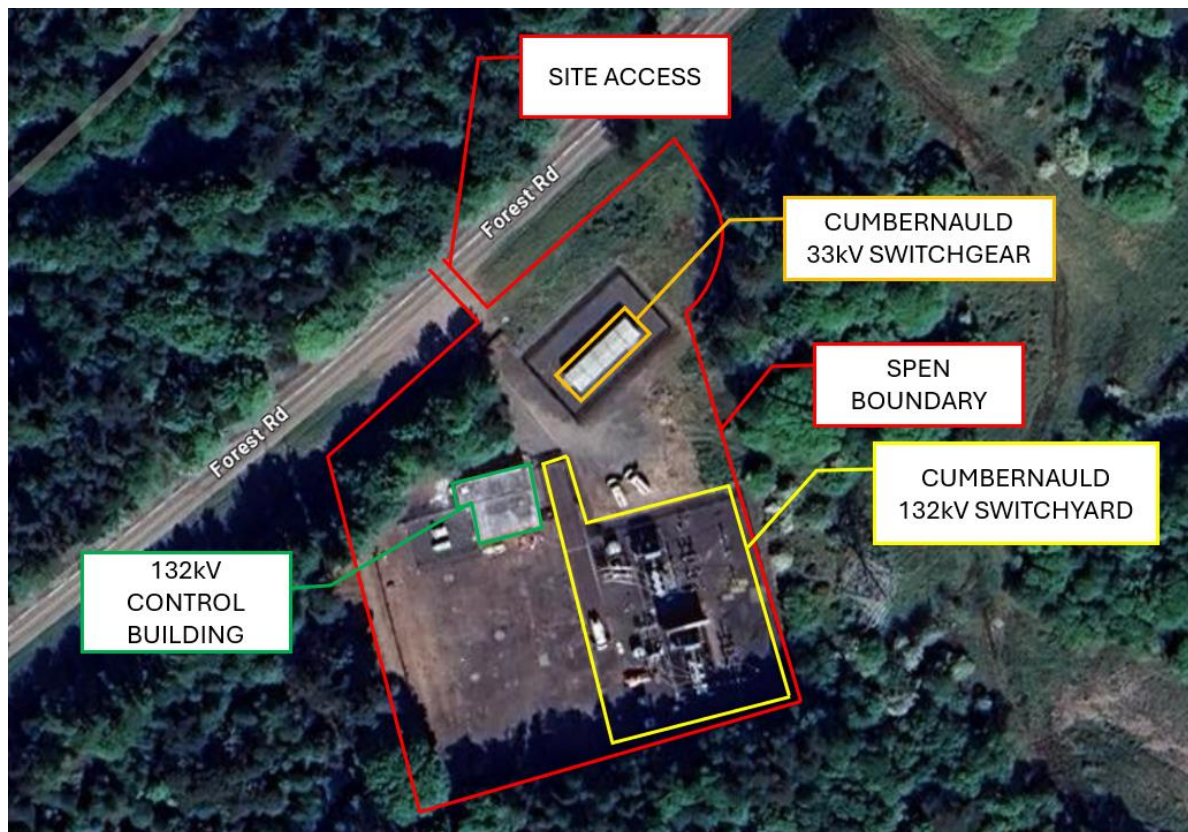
Access Point via Forest Road to existing Cumbernauld Substation and current layout
